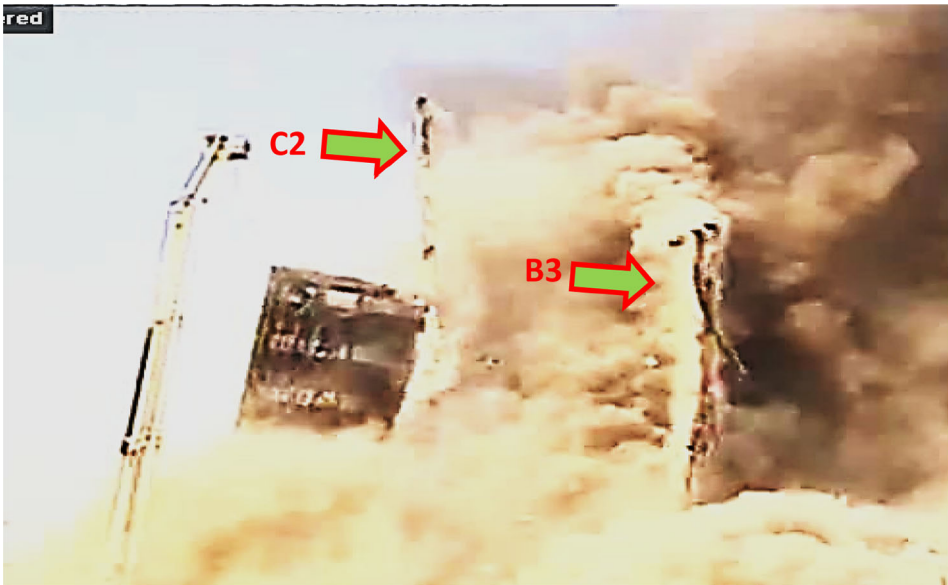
Overturning of column B3 to east direction while column C2 is still remained.
